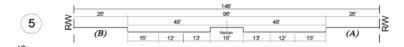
CITY OF ONTARIO GENERAL PLAN ROADWAY CROSS-SECTIONS
